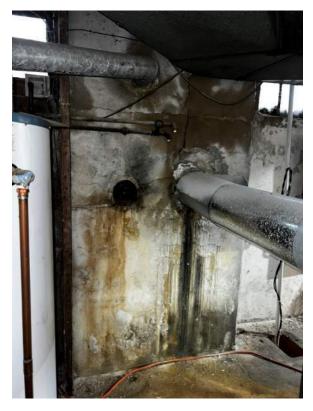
IMG_1256– Significant water damage and staining is present on interior side of East chimney foundation. Foundation for chimney is spalling and contains major vertical and horizontal cracking
